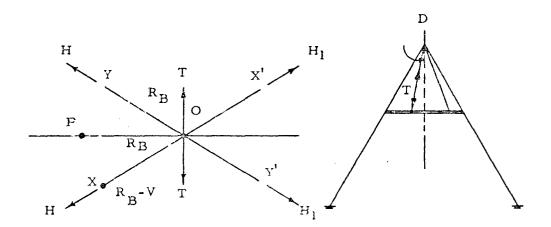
"A" FRAME BRIDGE, PLAN VIEW
